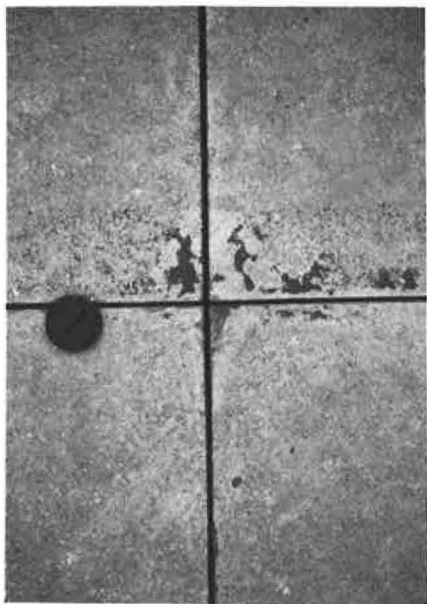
Transverse and longitudinal sealed joints on test section G2.
